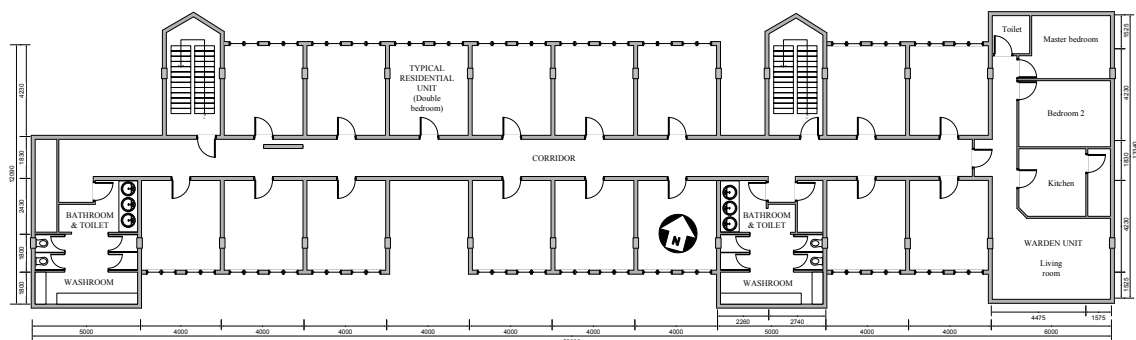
Floor plan of 6th RC (new additional residential block - Block H)
